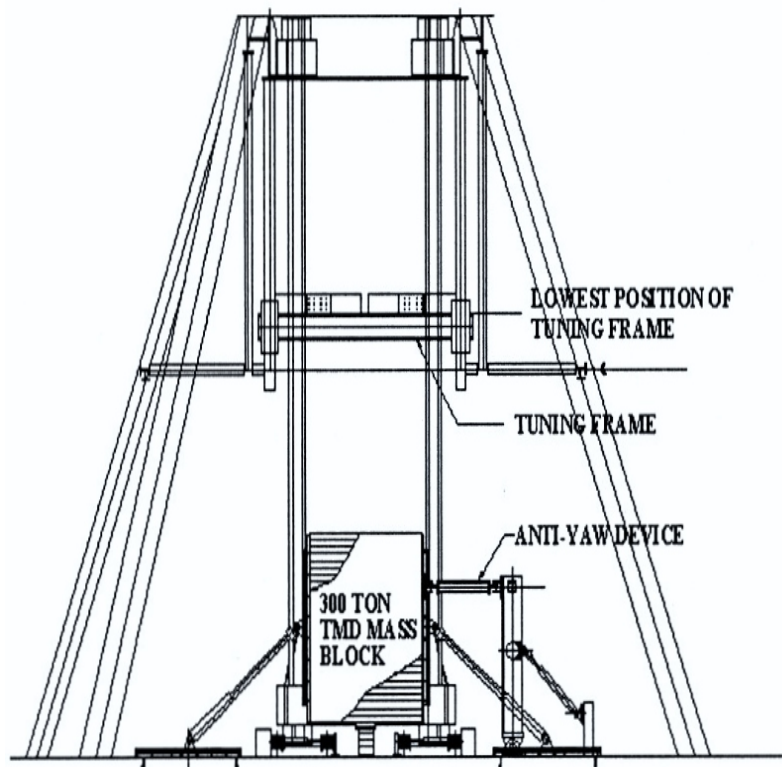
Nested pendulum Tuned Mass Damper design for Park Tower [32]
